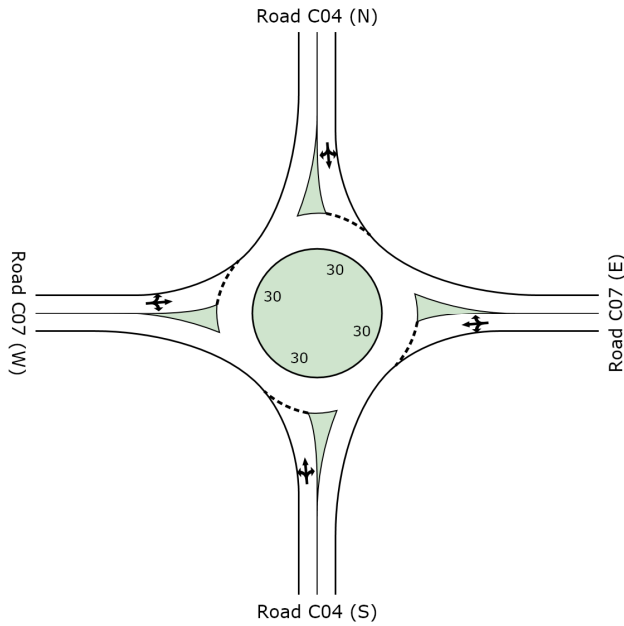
Road C04/Road C07 Give-Way Intersection
